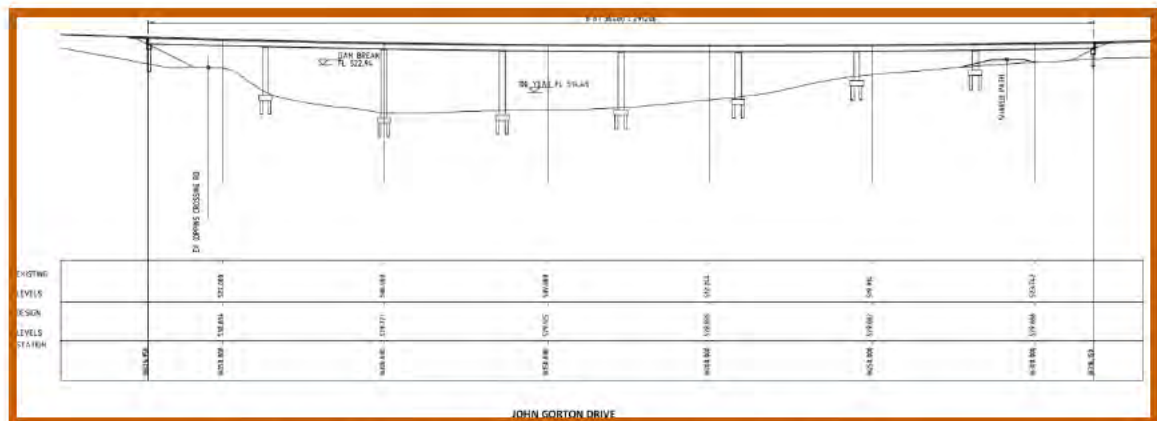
John Gorton Drive Preliminary Bridge Profile
